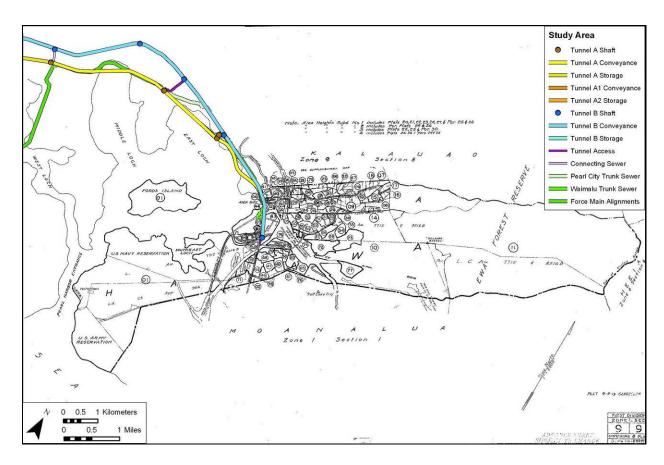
Tax Maps [1] 9-8 and 9-9, showing alternate wastewater tunnels and facilities from Waiau to Hālawa
